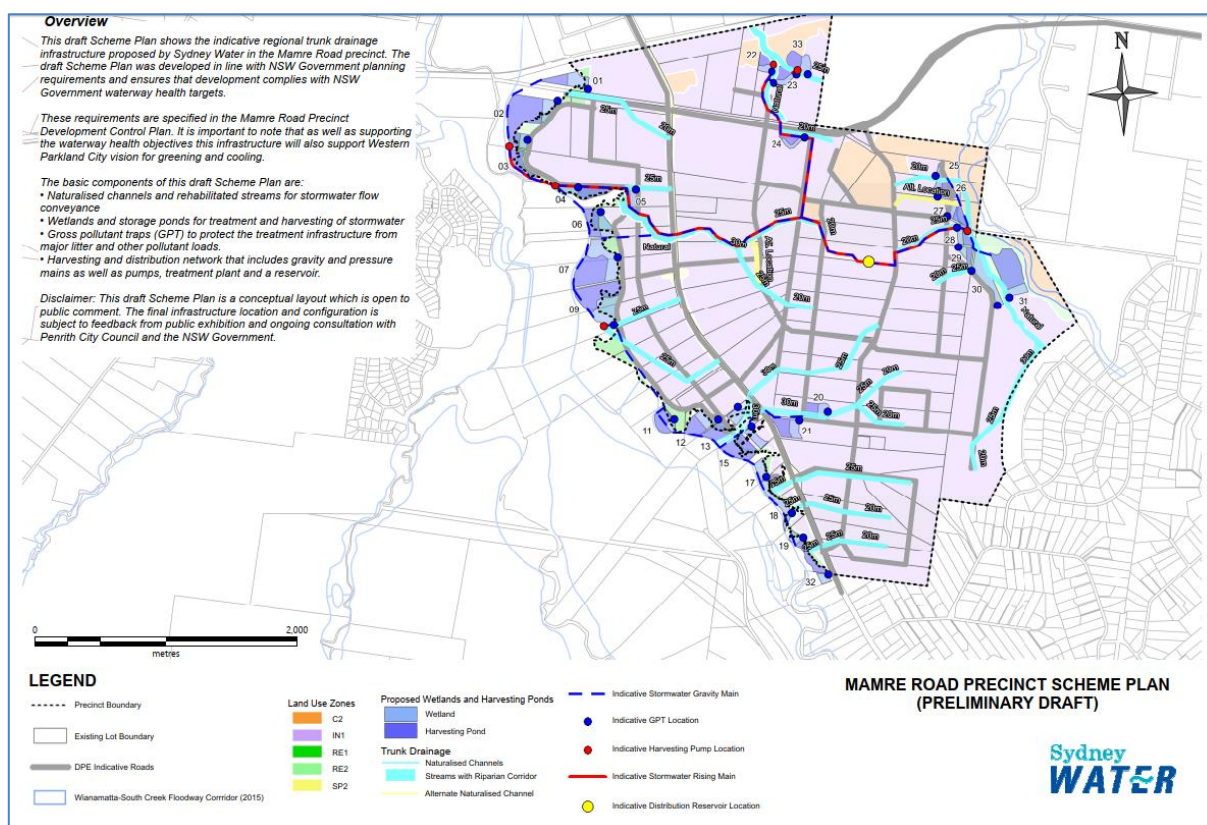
Mamre Road Precinct Stormwater Scheme Plan
